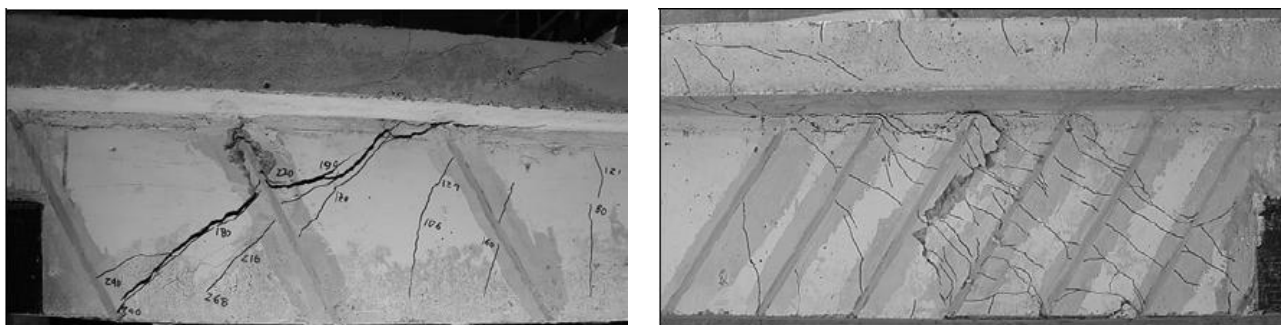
Laminates inclination of 60°: a) debonding (beam 2S_3LI60); b) concrete tensile failure (beam 2S_8LI60)
